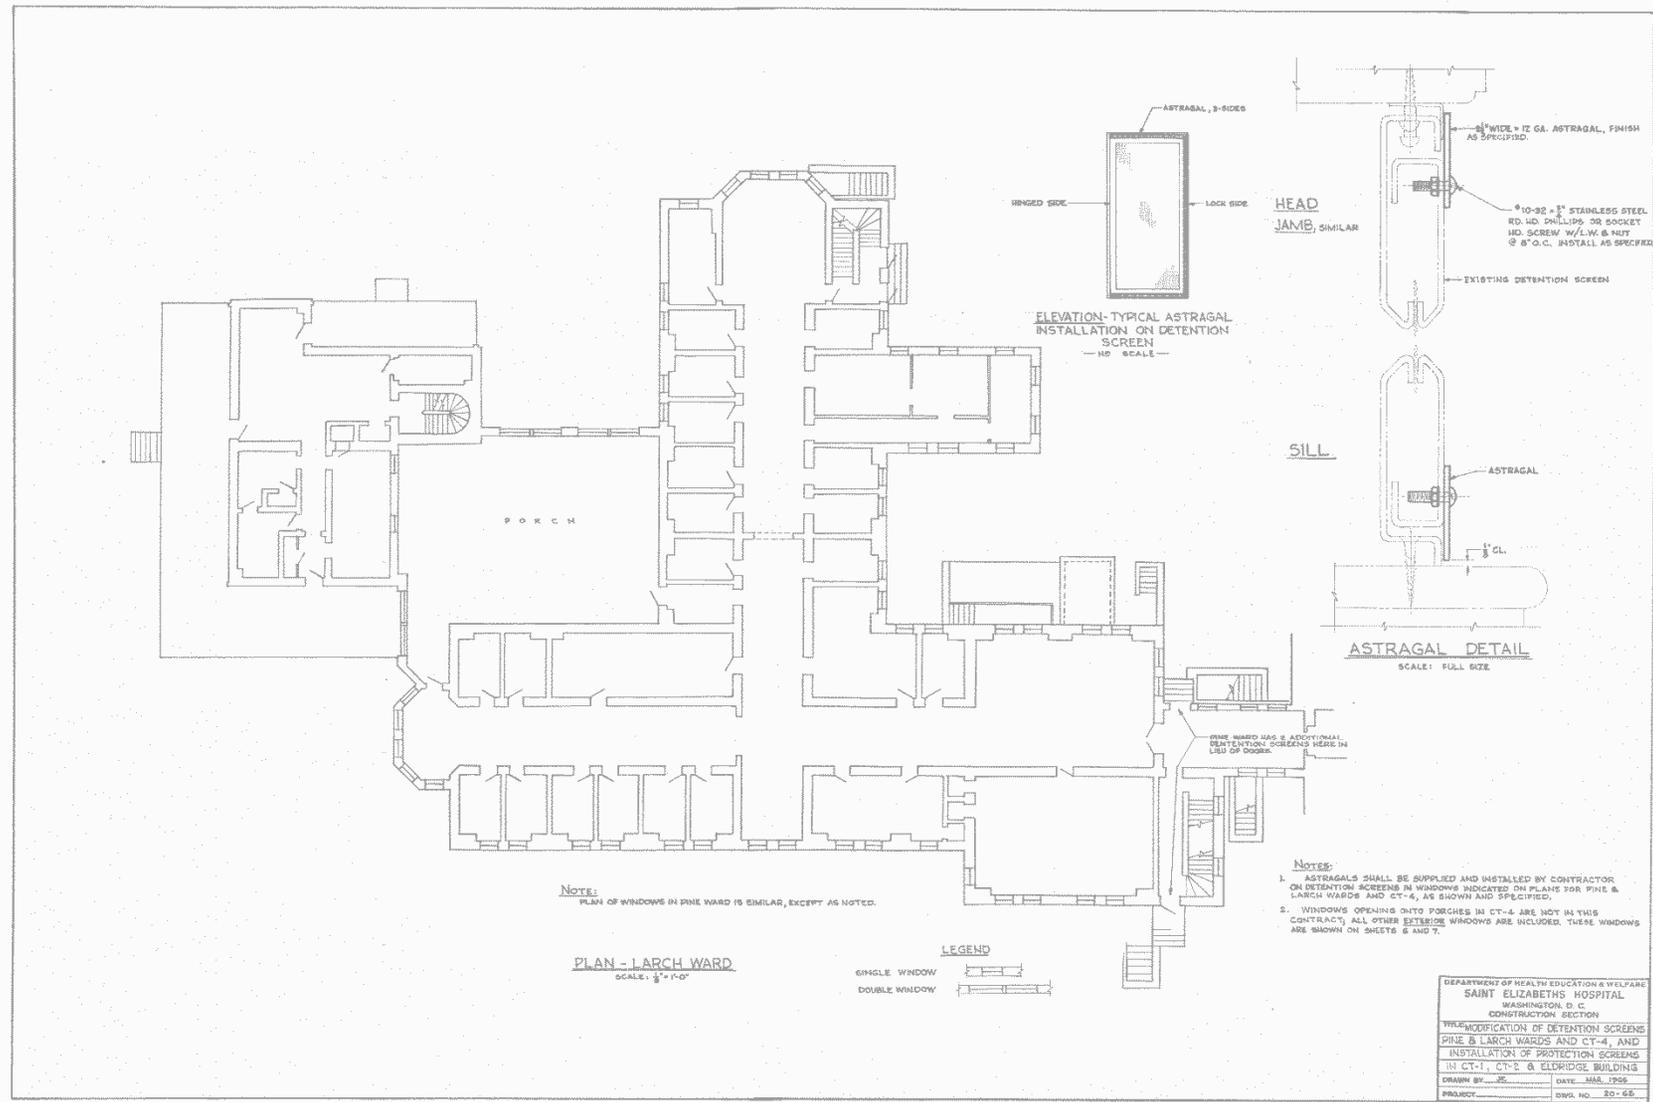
First floor plan of Pine showing detention screen installation, 1965. Source: GSA Archives, image DC0179SE0P001.
